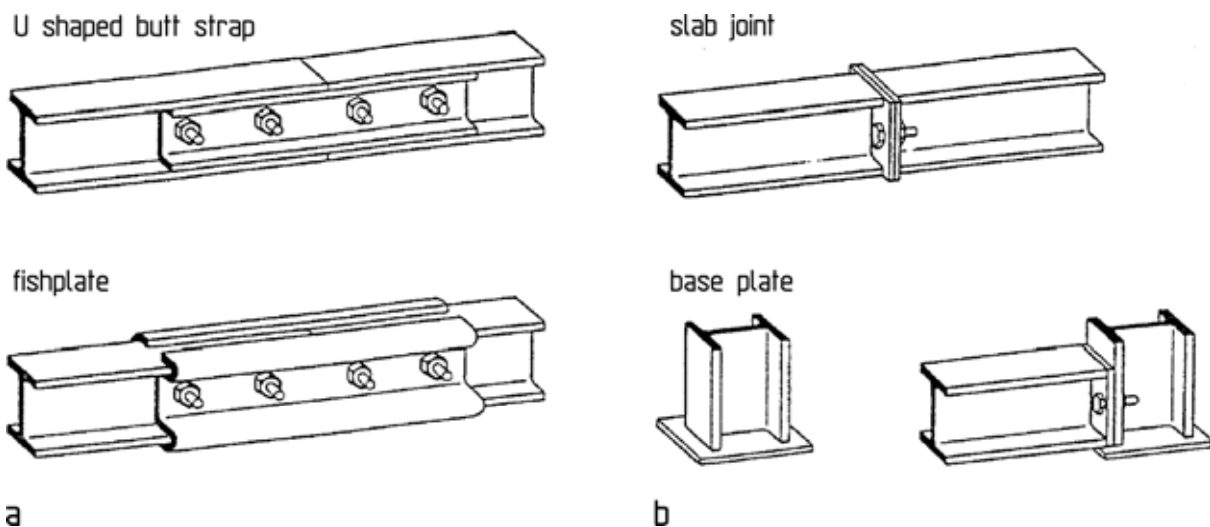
HEB profile joints: a) Butt strap joints; b) slab joints
